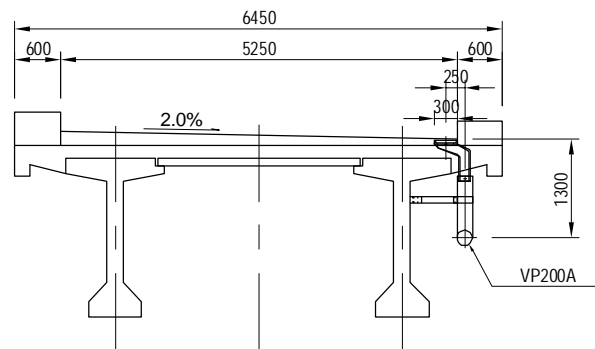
DETAIL OF DRAINAGE FOR ON-RAMP (1) S = 1 : 400
